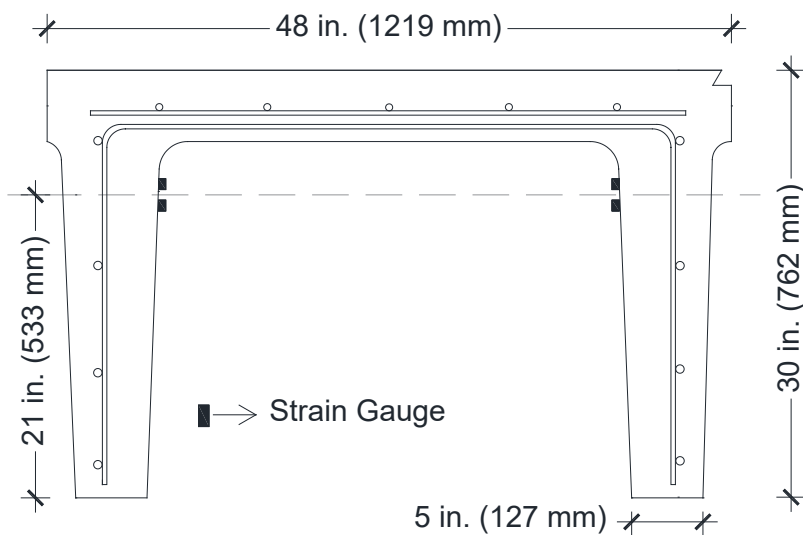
Girder Strain Gauge Instrumentation Plan for Shear Response of 30-in. Deep Double-Tee Girder Bridge – Section View
